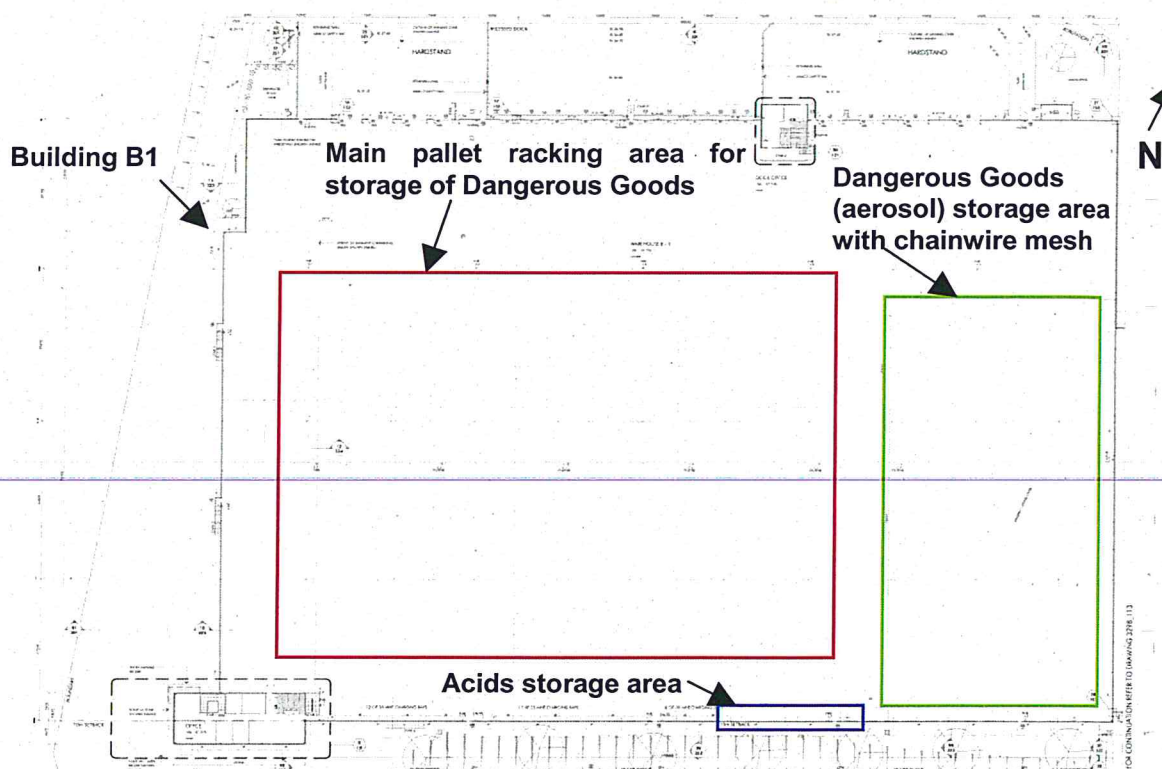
Proposed Internal Floor and Storage Plan for Building B1
